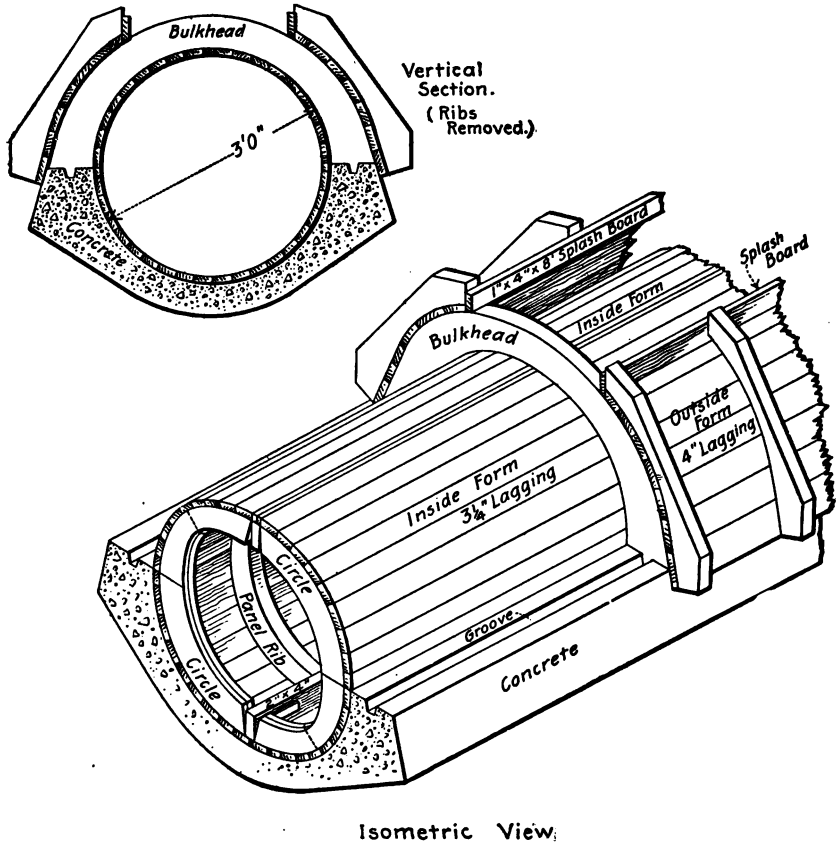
Wooden forms for building circular sewer in one or two operations, Louisville, Ky.
